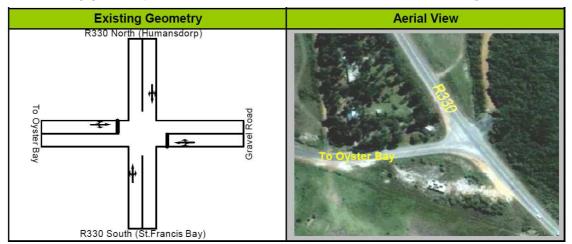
Main Street (R330) / Park Street Existing Intersection Geometry
